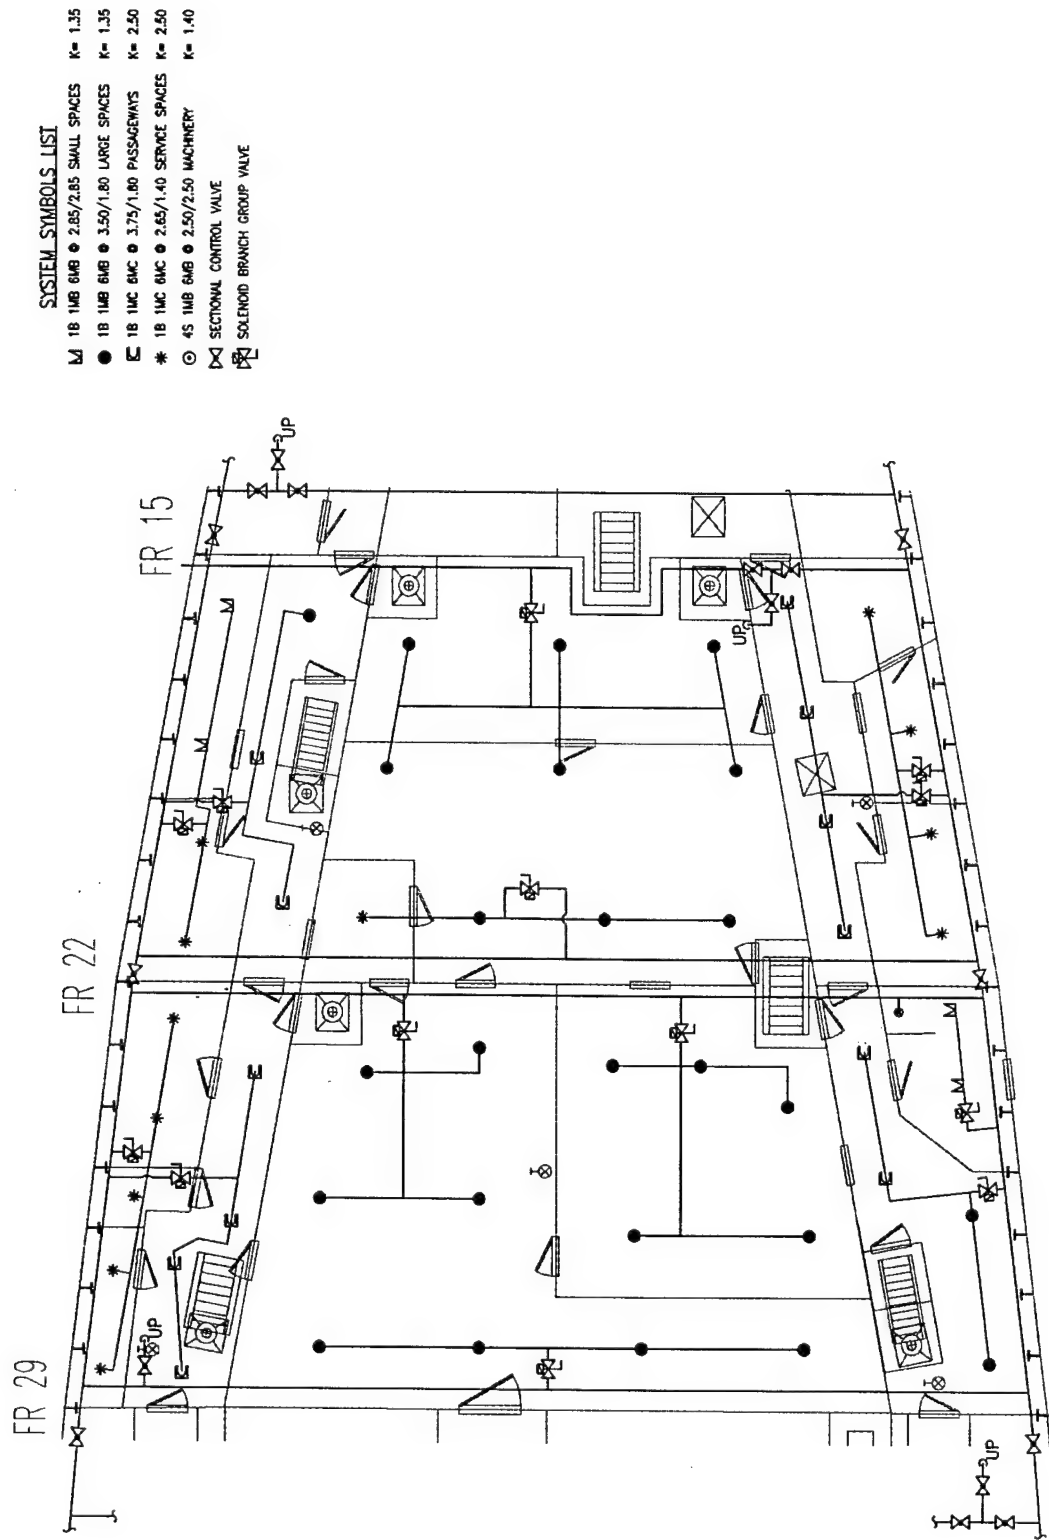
Sectional Loop piping layout, HP water mist system, Second Deck on ex-USS *Shadwell
